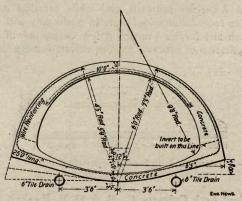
Arch Culvert at Kalamazoo, Mich.
